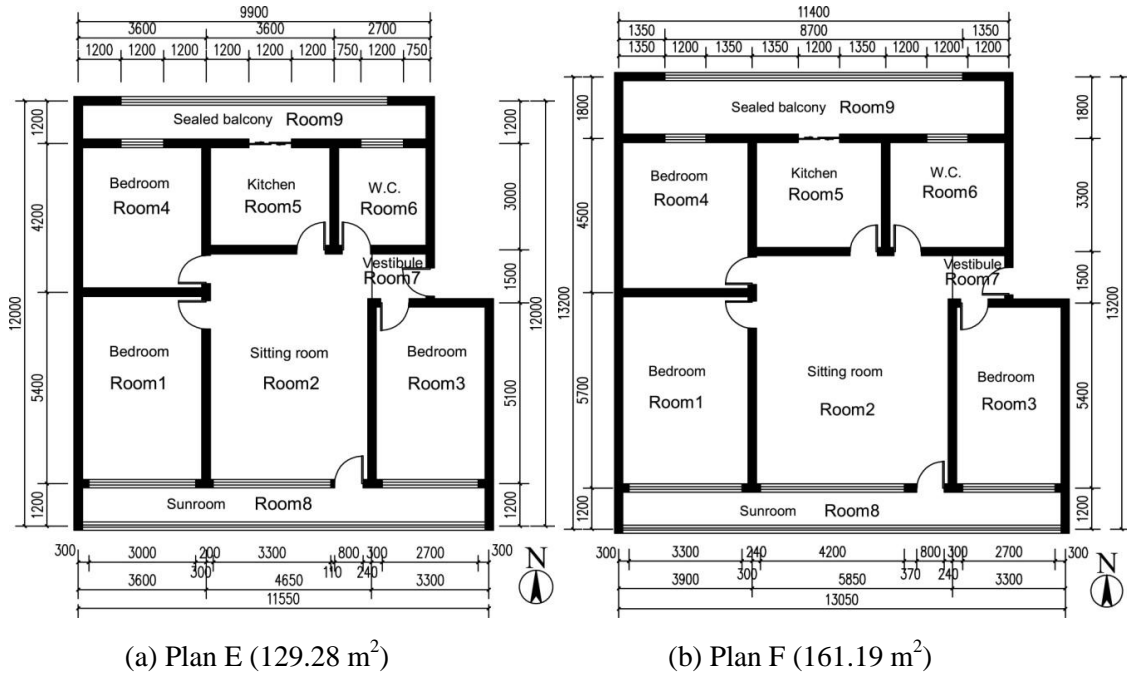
Layout drawings of new unit design for 2030 (Unit: mm)
